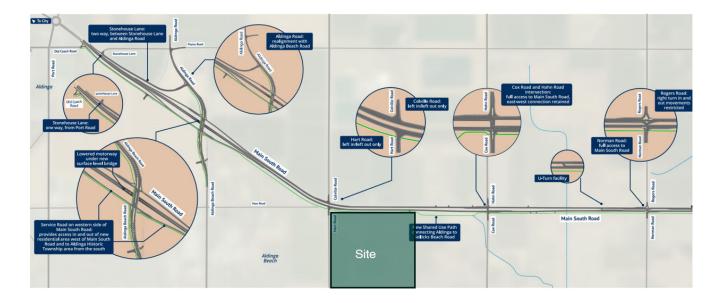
Main South Road Duplication Project (Stage 2) - Source: www.dit.sa.gov.au
